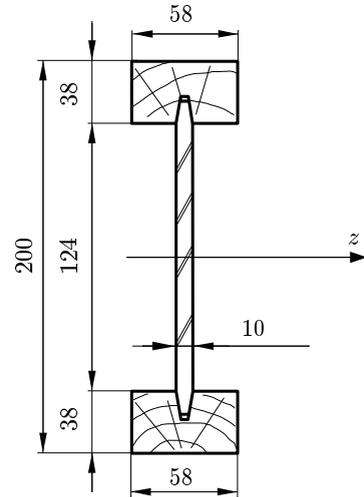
Cross-section dimensions of the composite I-beam [mm]
